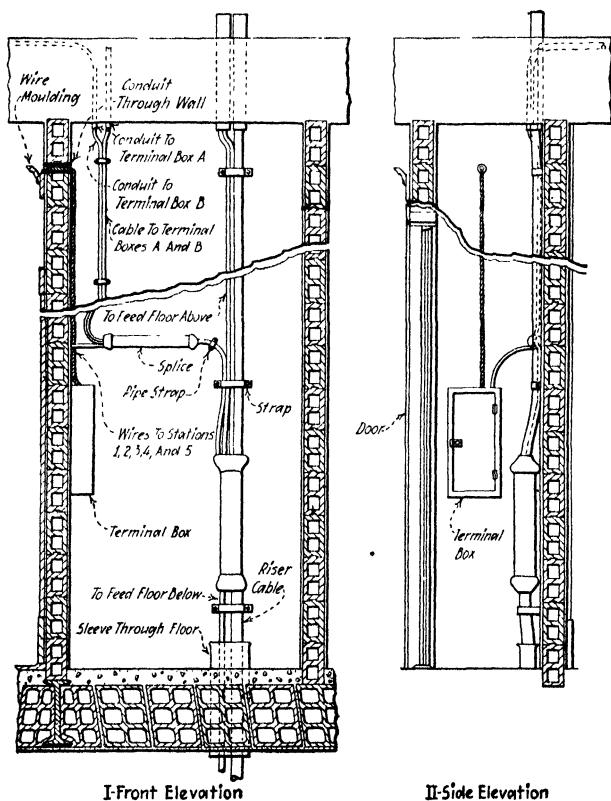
Sections through the cable shaft of an office building showing methods of distributing cables to terminal box.
